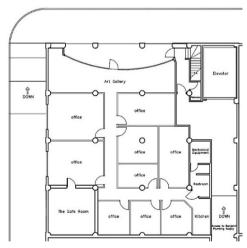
The first-floor plan of the art galleries and craftsman shops (source: author)
